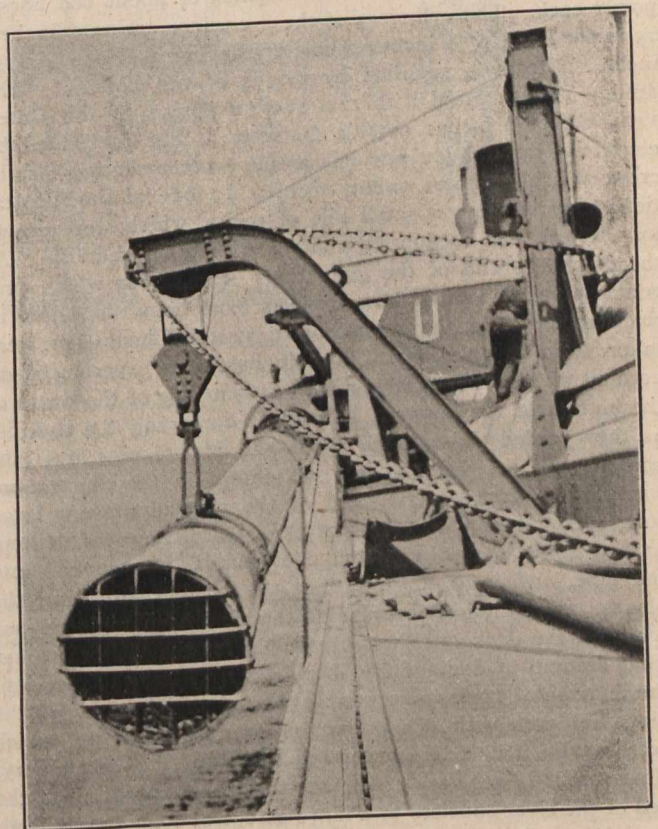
"Galveston," showing Suction Pipes being lowered over side.
